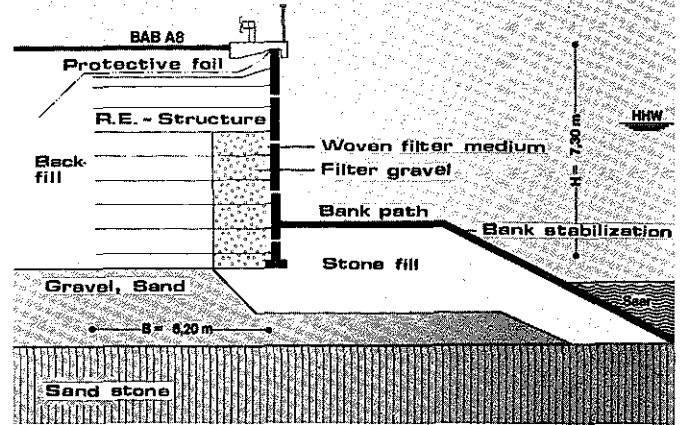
Retaining wall Fremersdorf, typical cross section of Reinforced Earth wall
